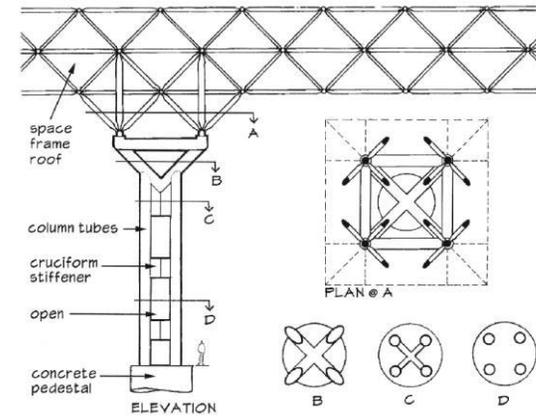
Javits Center, column details: (a) elevation, and (b through d) plan sections.
